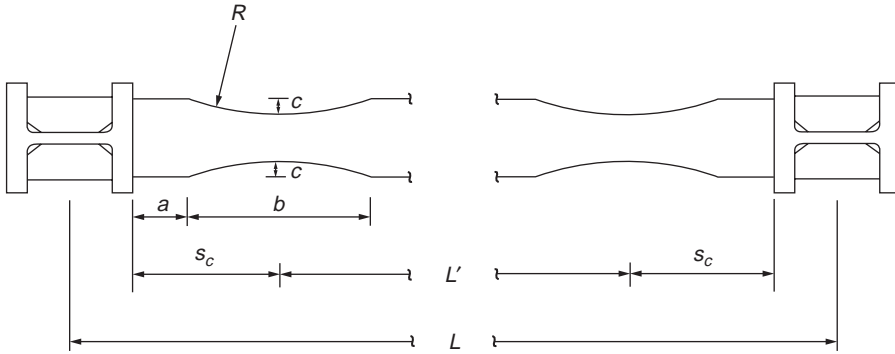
Key dimensions of a radius-cut reduced beam section.
